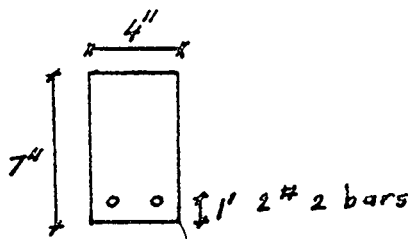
Cross-section of a Beam with #2 Plain Steel Bars.
